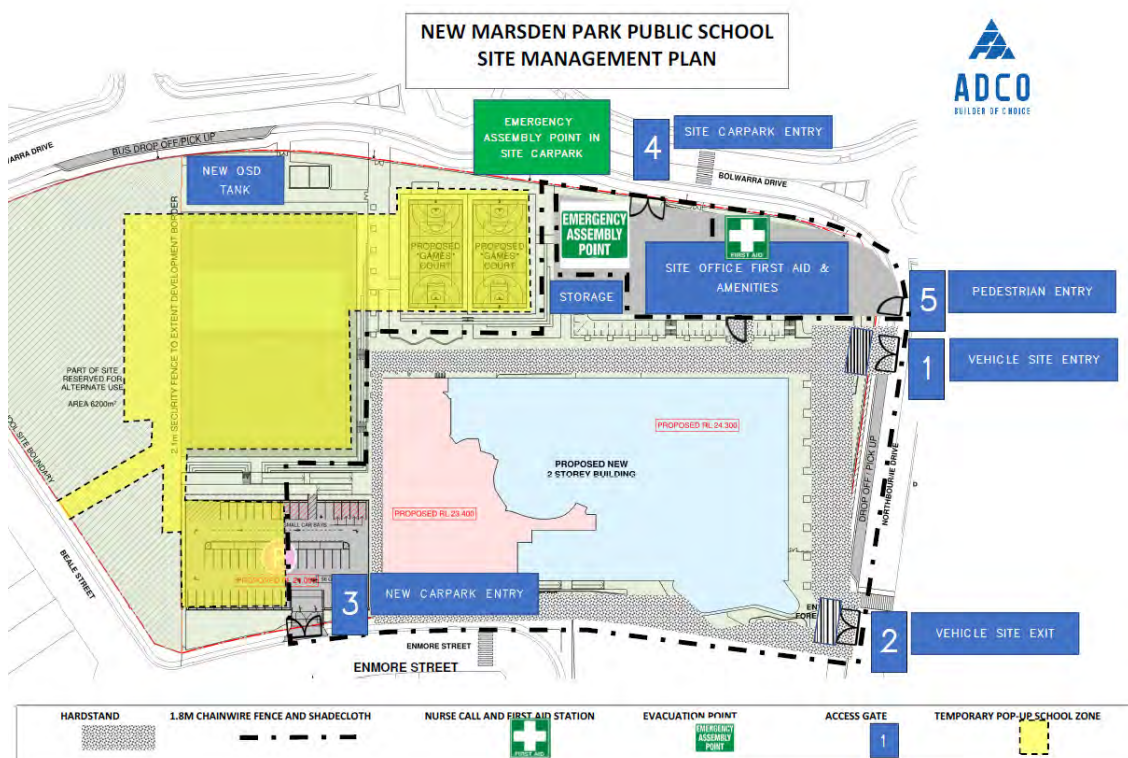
Site Mangement plan following construction of the temporary school, ADCO Constructions.
